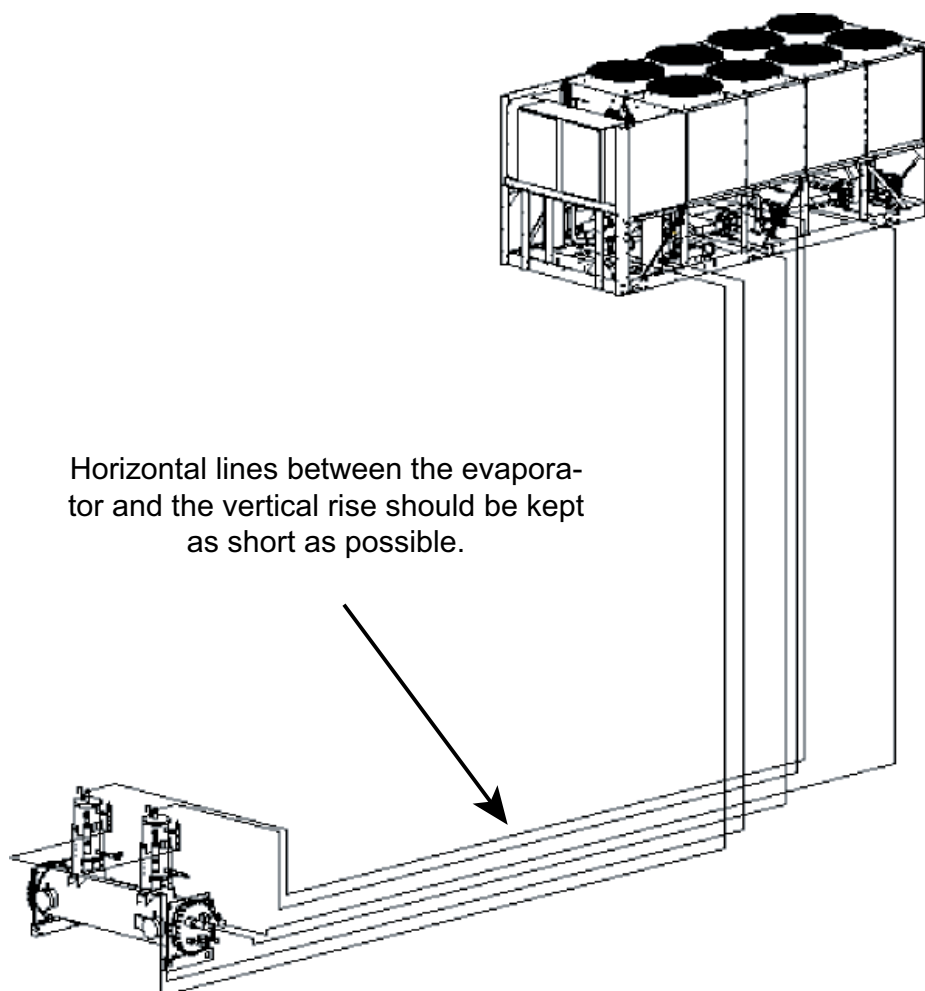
EVAPORATOR BELOW OUTDOOR SECTION
